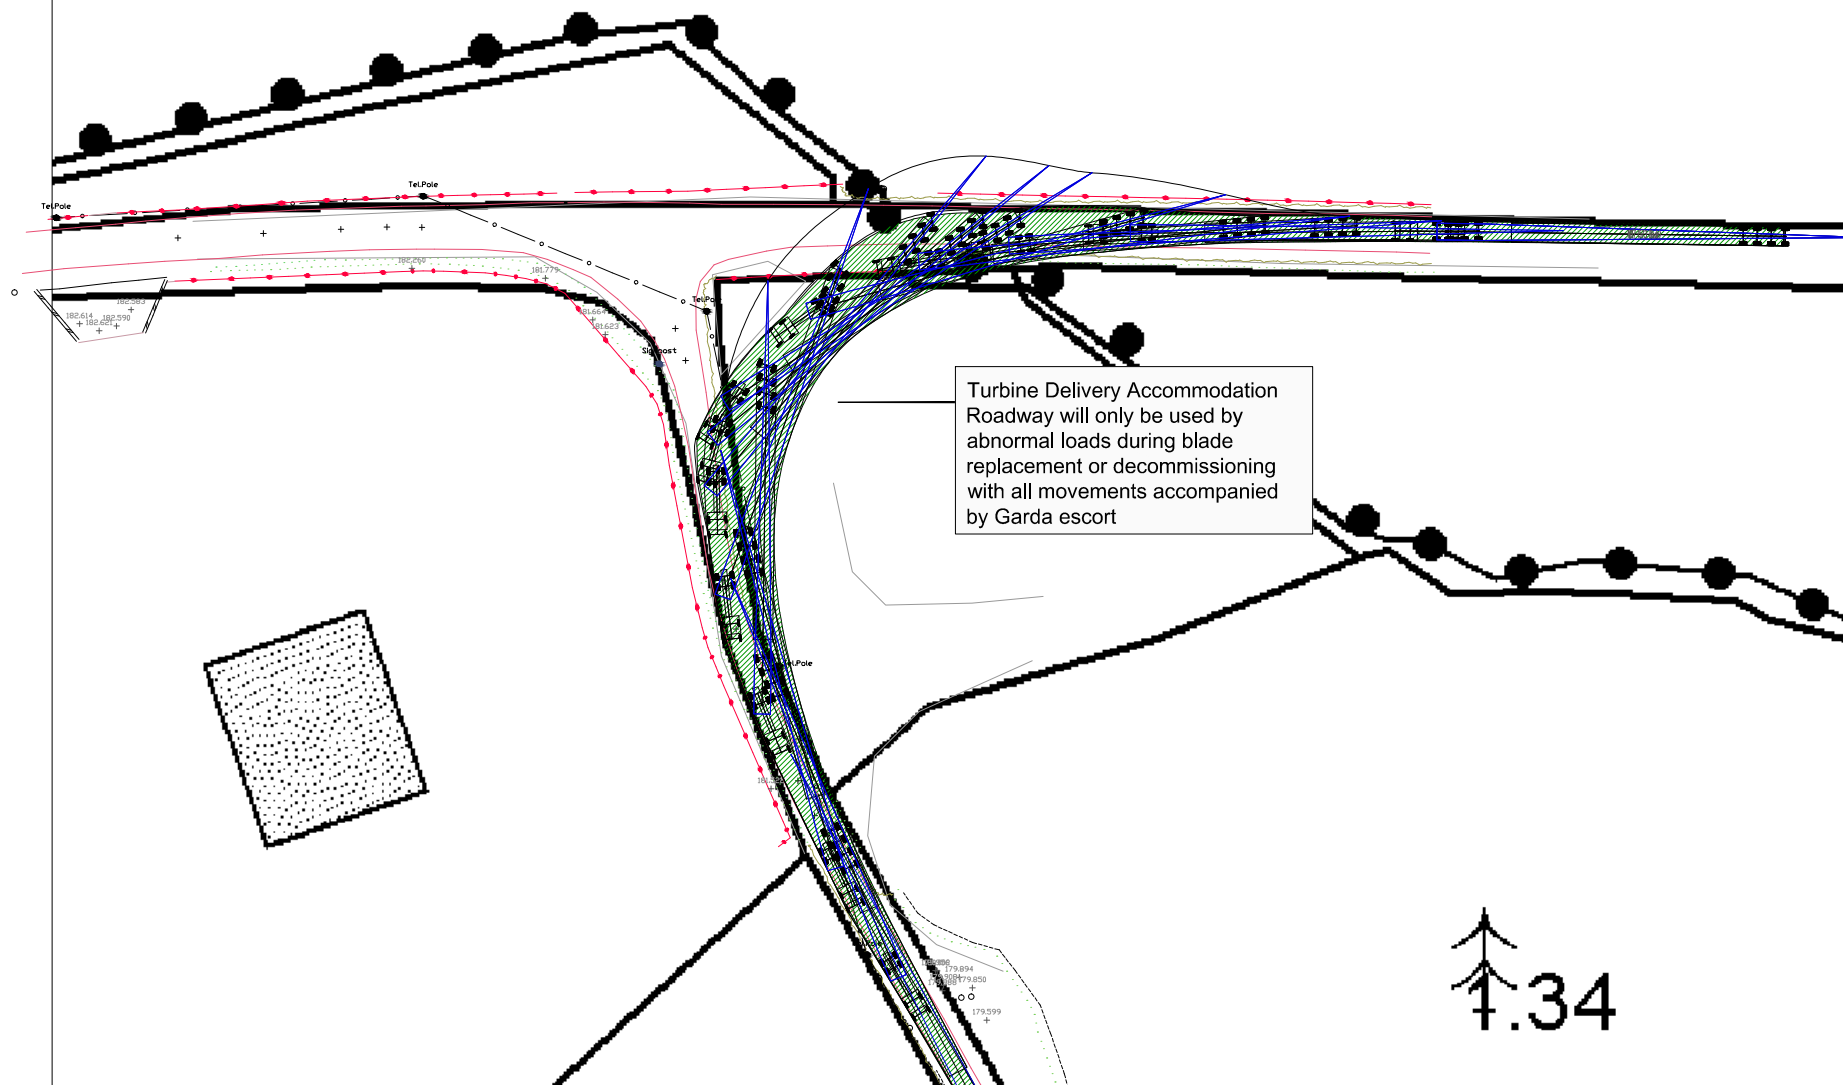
Location 5 - L3402 Gortanaddan Road Post Construction
